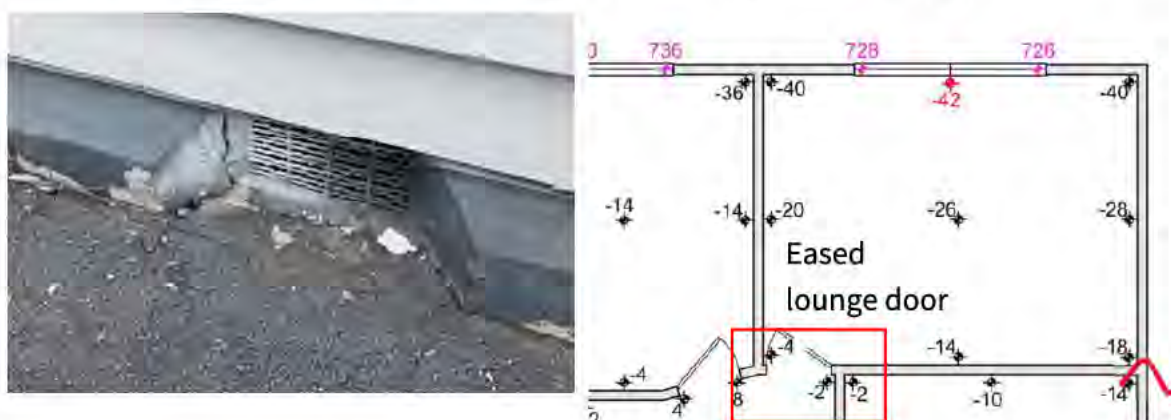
New foundation crack coincides with hinge point in floor levels. Red marker indicates crack location.
